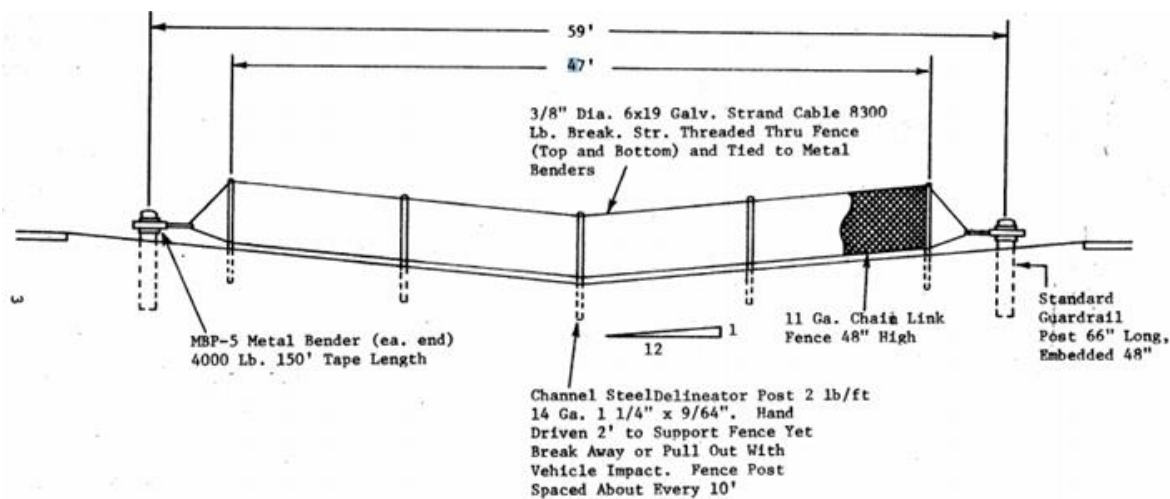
ELEVATION OF MEDIAN INSTALLATION
